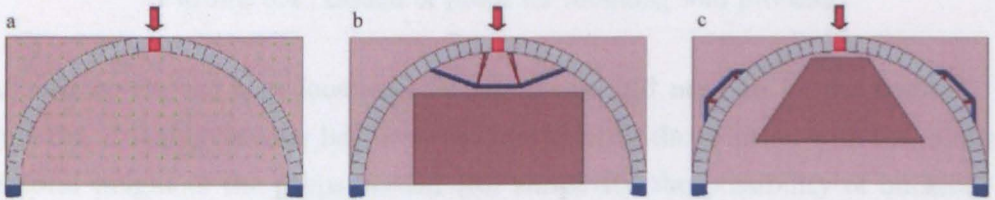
Design of reinforcement for an arch rib: (a) overloaded arch and design domain, (b) optimum layout of truss bar (rectangular prohibited zone), (c) revised layout of truss bars (trapezoidal prohibited zone)
